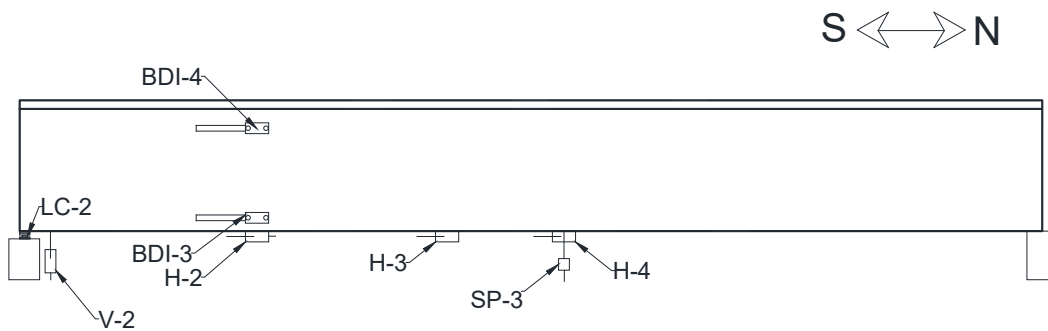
shows the LVDT installation plan used in strength testing of the 30-ft (9.14-m) long girder. Four LVDTs were installed to measure horizontal displacements to be converted to the concrete strains. Two vertical LVDTs were used to measure the rubber bearing pad compressions and then to obtain the net midspan deflections. Two horizontal LVDTs were installed at the midspan to measure girder longitudinal rotations and curvatures.
